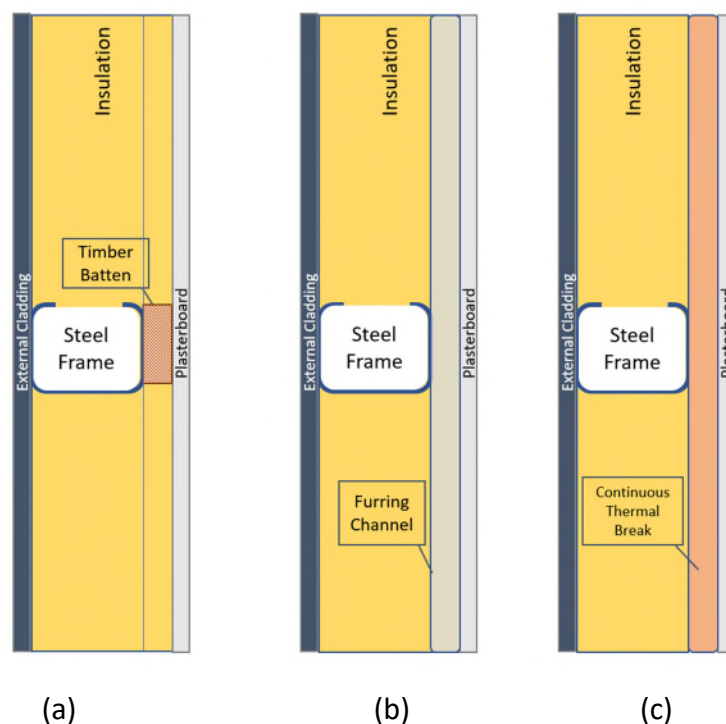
Illustration of a light clad steel frame wall construction (a) timber battens; (b) furring channels; (c) continuous thermal break
